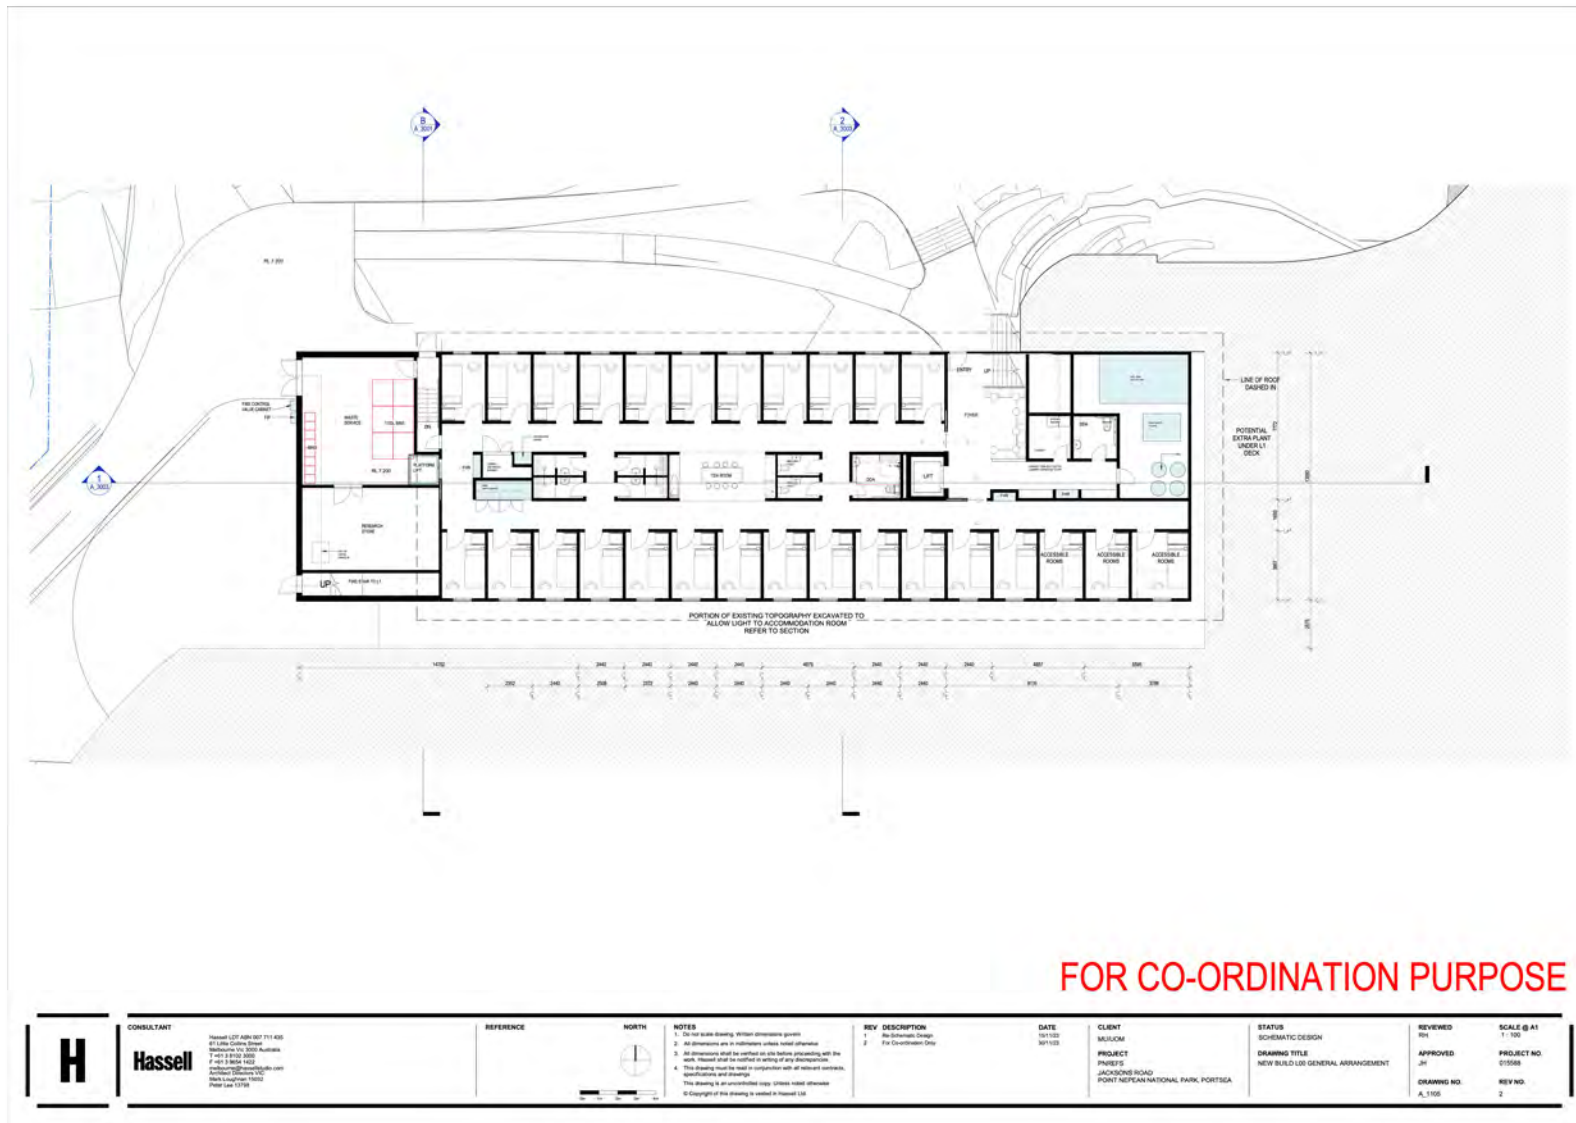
Development Plan showing ground floor of proposed new accommodation building. Document provided by UoM.
